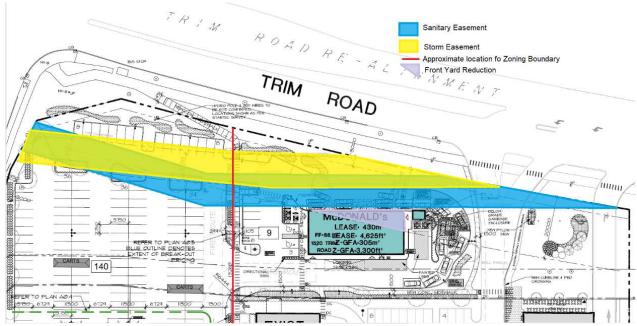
Capture of early Site Plan with City Easements and the portion of the restaurant building in the front yard setback highlighted
